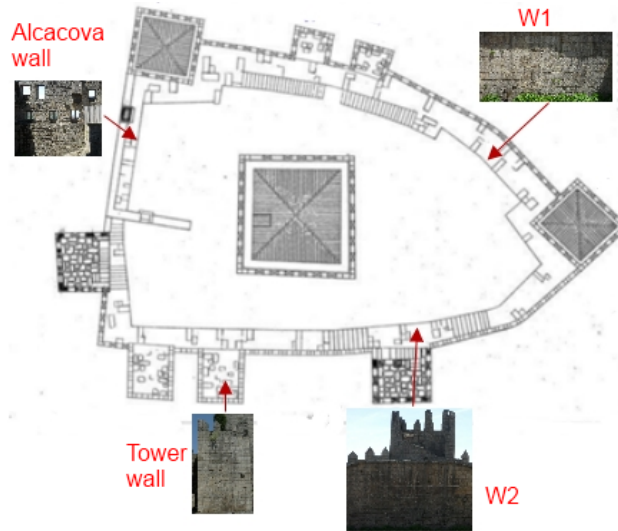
Location of the Wall 1 (W1), Wall 2 (W2), Tower Wall and Alcaçova Wall
